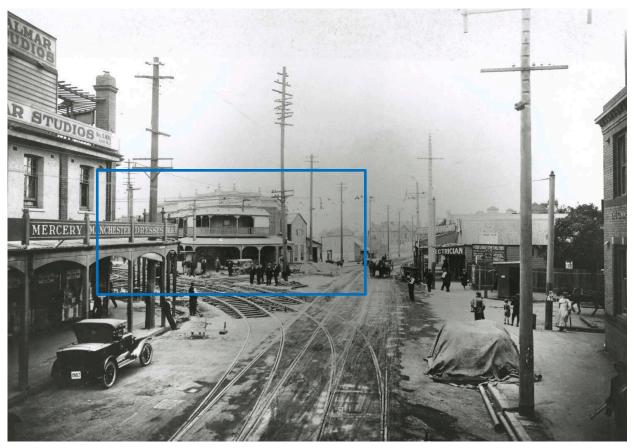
Laying tram tracks at Crows Nest, c1920. This view is looking south along Lane Cove Road at Falcon Street and Willoughby Road intersection. Part of the subject site is visible in this photograph (outlined in blue)
